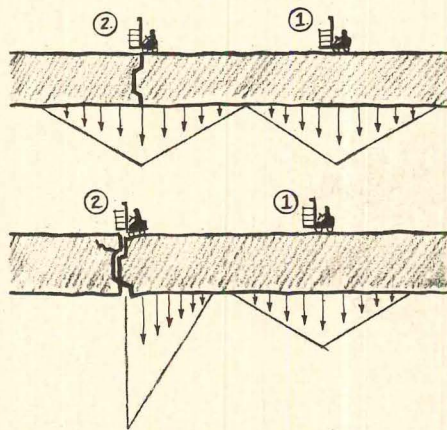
a concrete key works at first, but fails to distribute load as the slabs pull apart.
